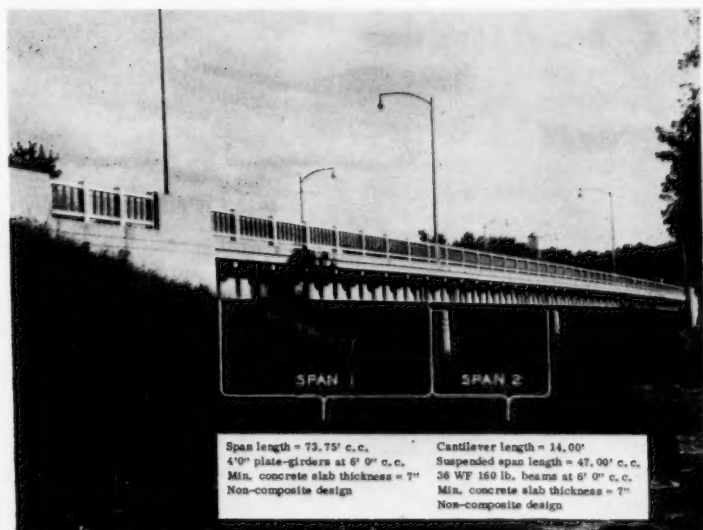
Bridge B1 of 34-6-1. On route M-66 south of Ionia. Five-span plate girder and rolled beam cantilever-type bridge.
